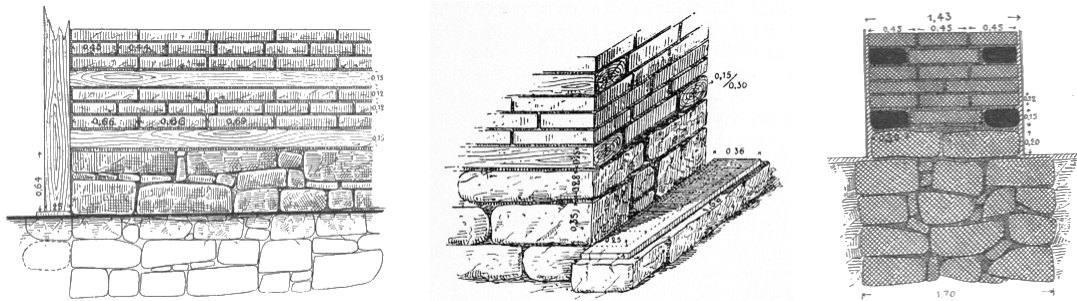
Troia, Megaron IIA in Level II, front room (*Vorhalle*) mudbrick masonry wall with horizontal timber beams, placed parallel to the wall faces [9]. The mudbrick walls were 1.43m thick with a stone socle of the same width and 1.70m wide stone foundation wall underneath. The timber beams were 30cm wide and 15cm high, placed at intervals of c. 41cm or three courses of brick. The timber *anta* or *parastas* in front is visible on the left.
